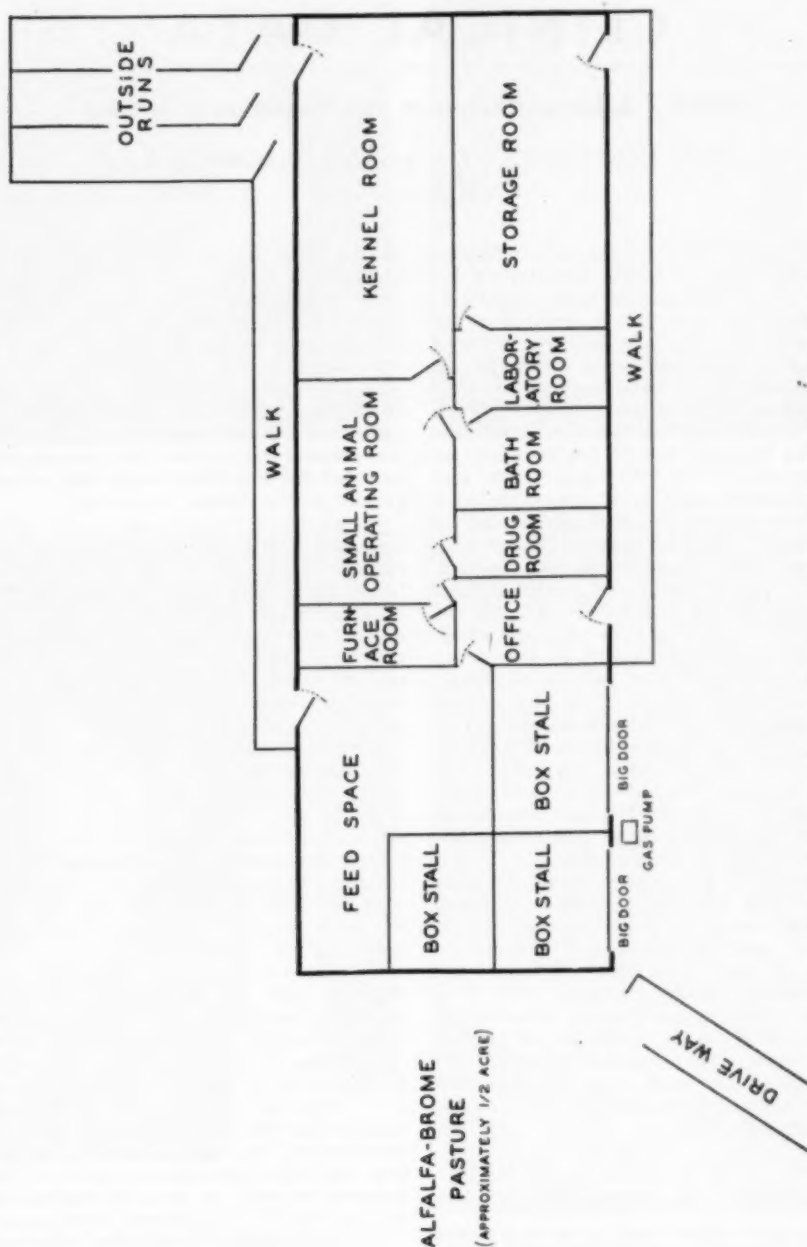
The floor plans and layout of the Emerson Veterinary Clinic in Eagle Grove, Iowa.
